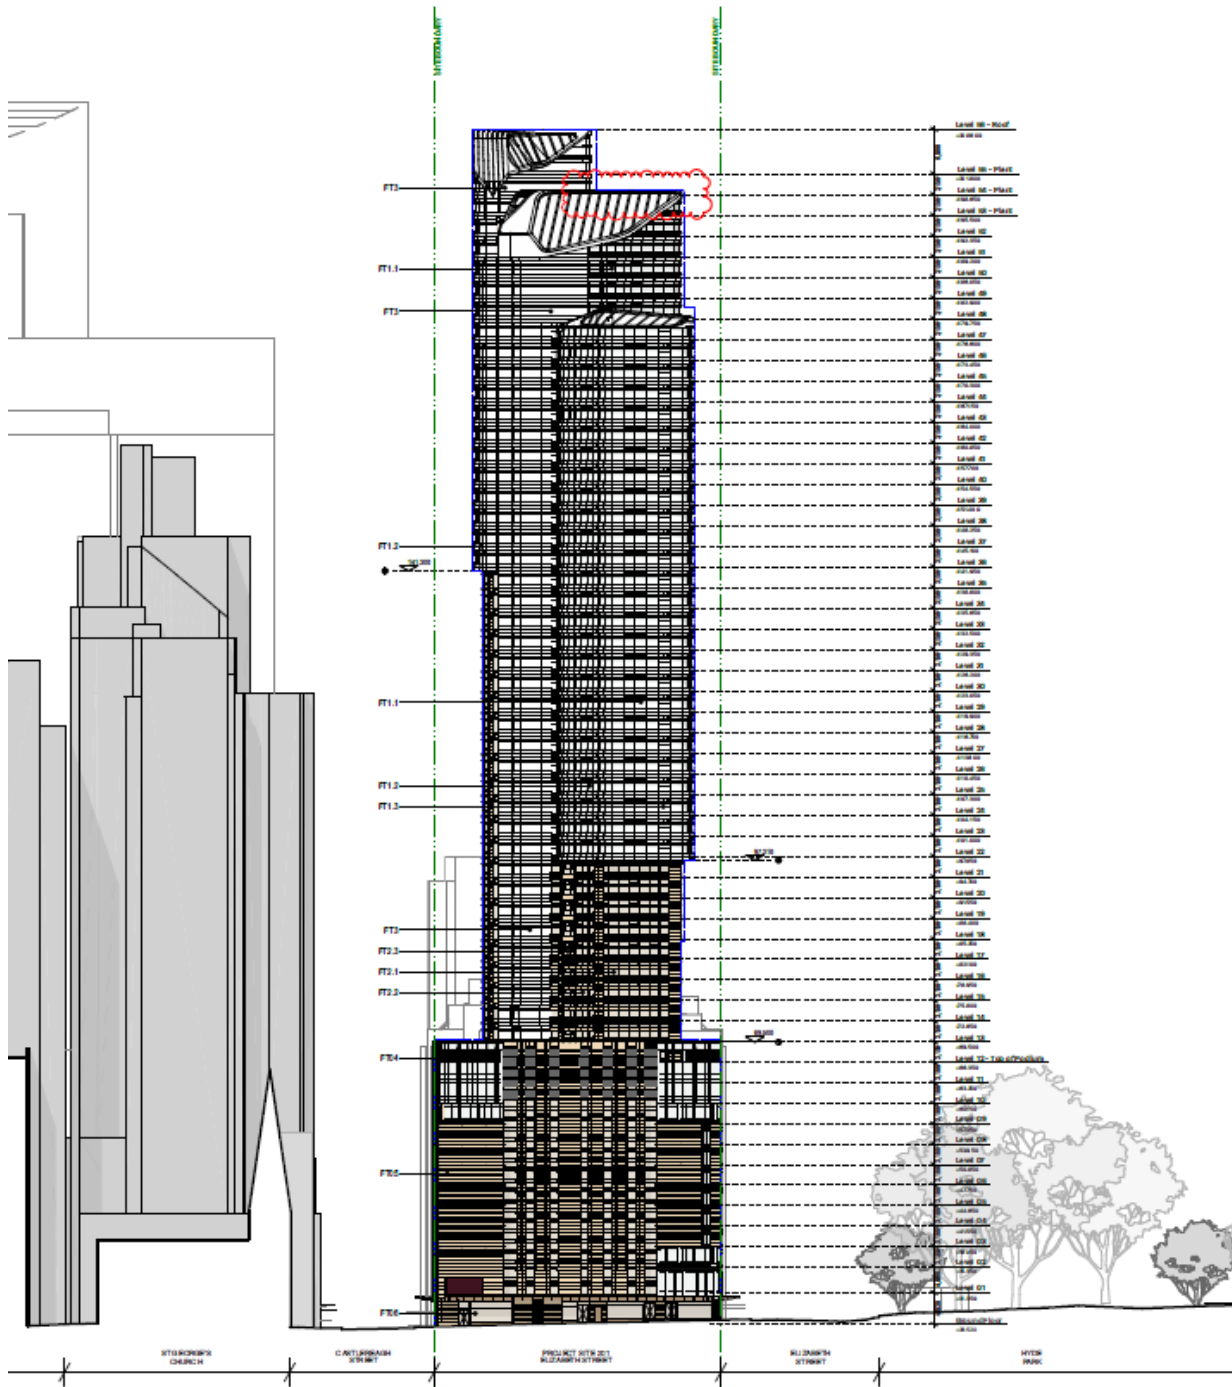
| Proposed south elevation (Source: Ethos Urban RtS amended architectural drawings)
